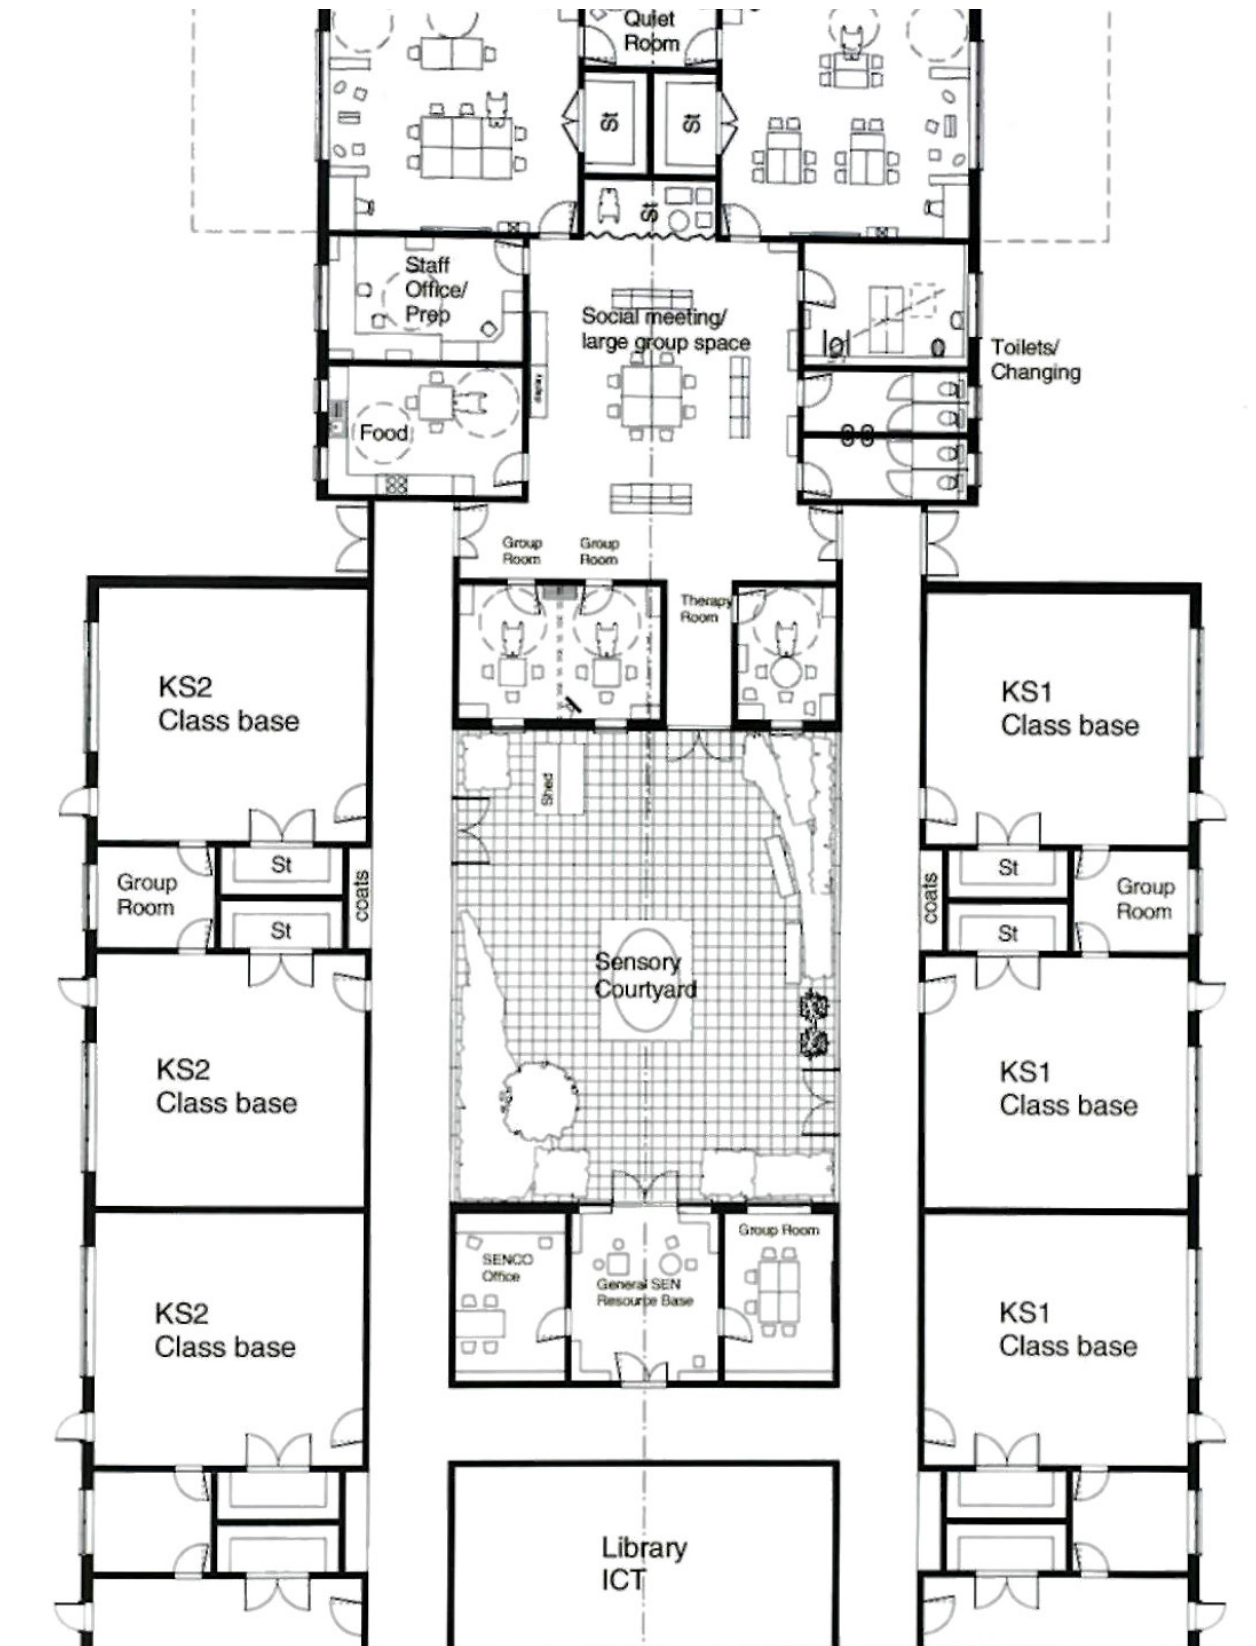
An example plan of a SEN classroom adjacent to gen ed classrooms
